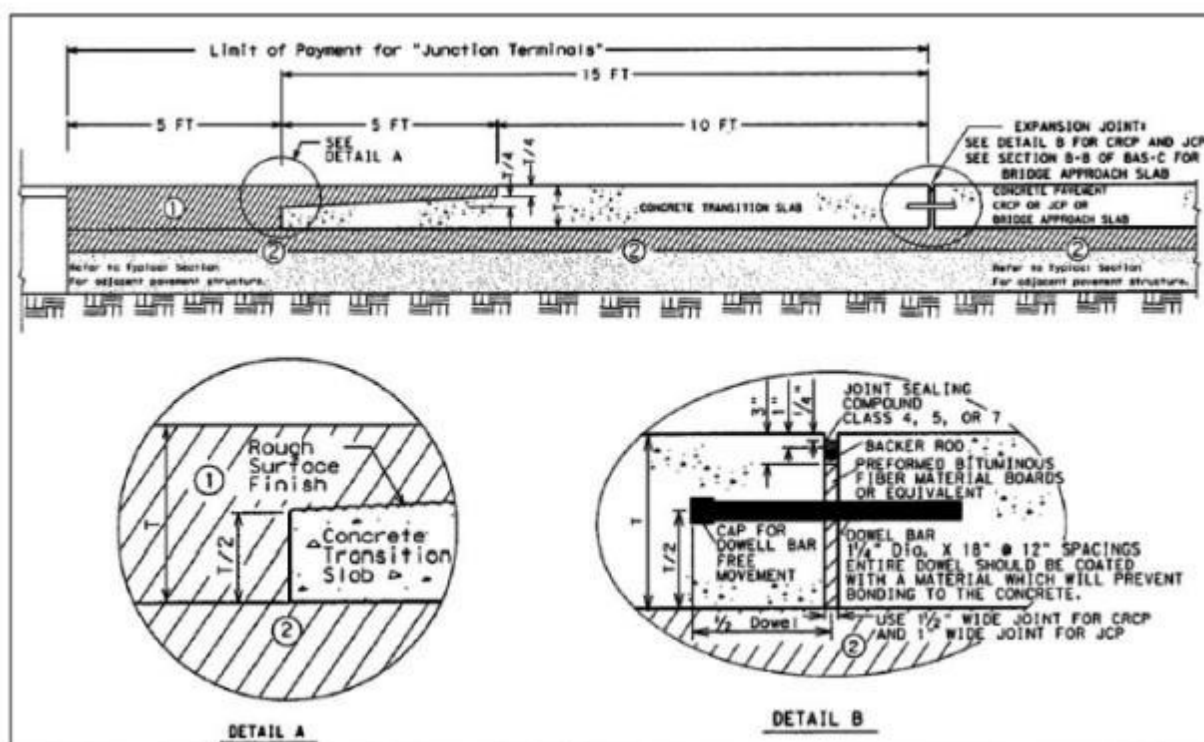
Transition between Flexible Pavement and Concrete Pavement (6).
